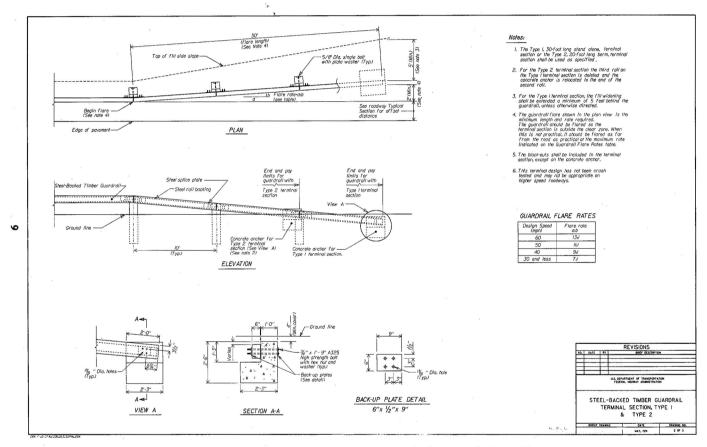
Steel-Backed Timber Guardrail -- Terminal Details.
